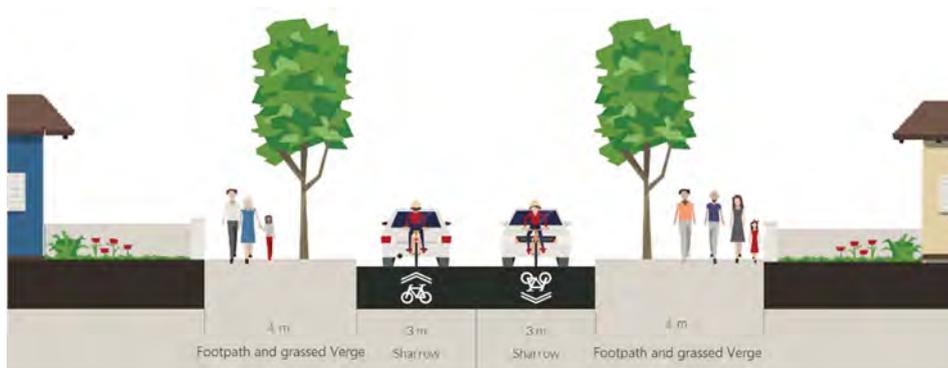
Route 7A, Cross Section A-A Proposed
